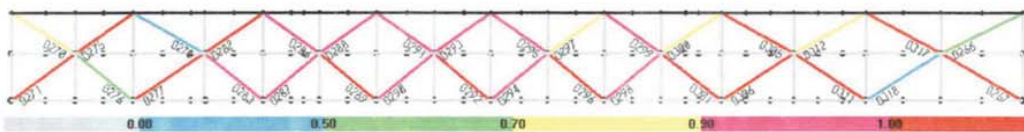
North Belt Truss between floors 22 and 24 diagonal diagram
